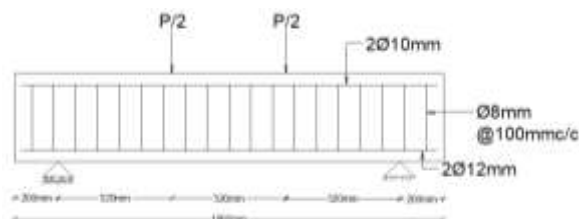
Longitudinal Profile of the loop stirrup beam (LSB).
